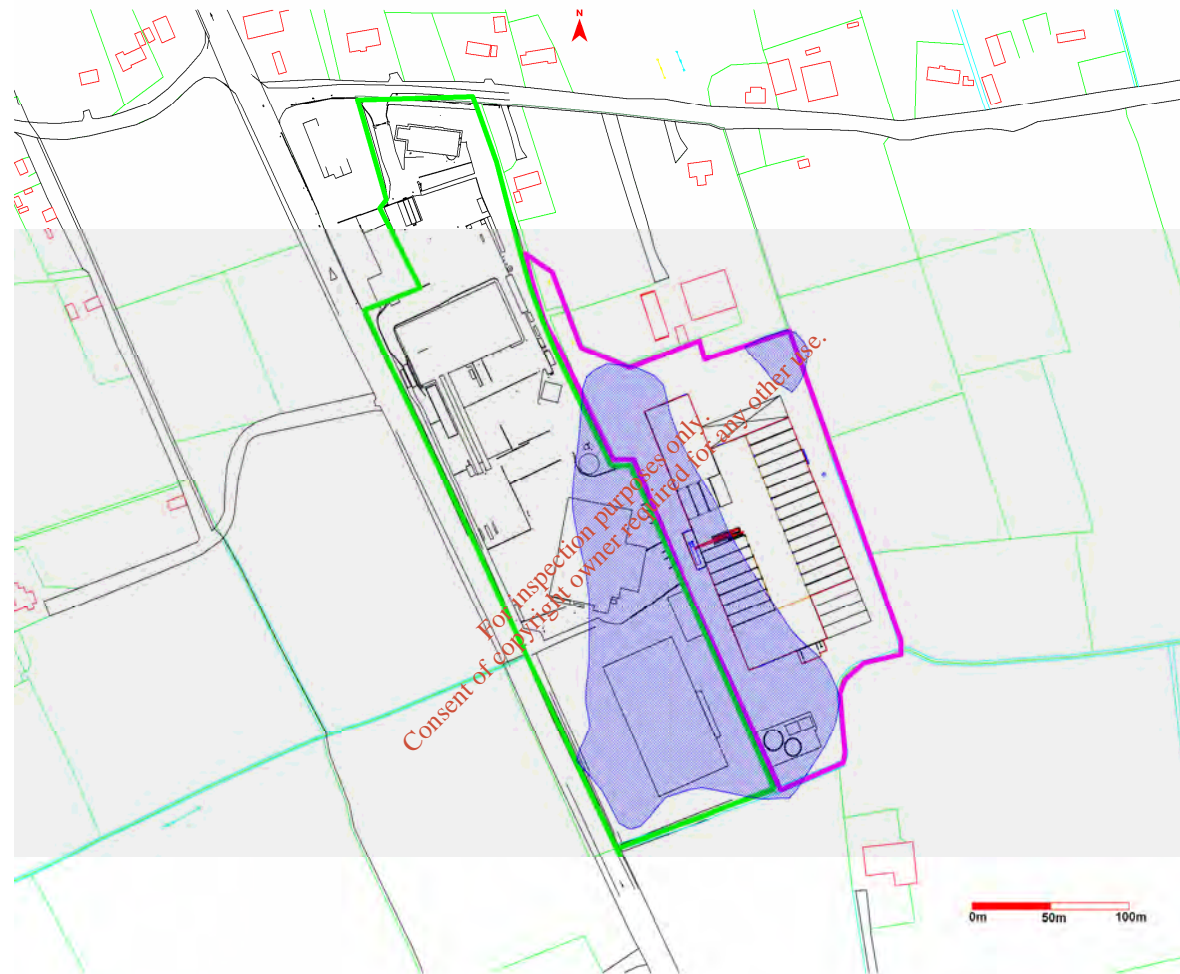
Aerial diagram of proposed Panda Waste Dry Fermentation and RDF Facility design and proposed boundary (  )
